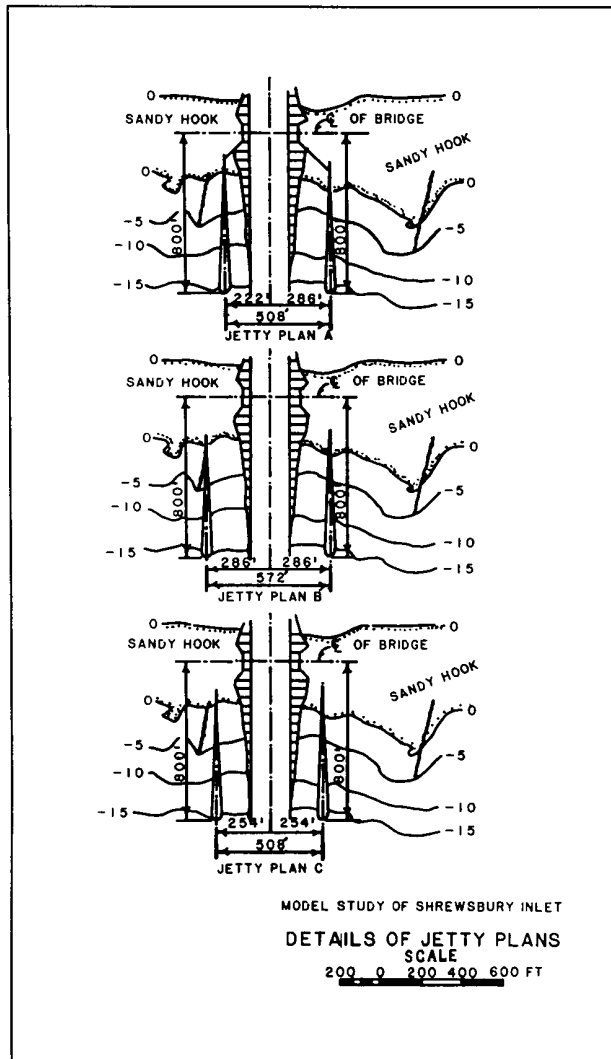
Details of jetty plans, Shrewsbury Inlet
